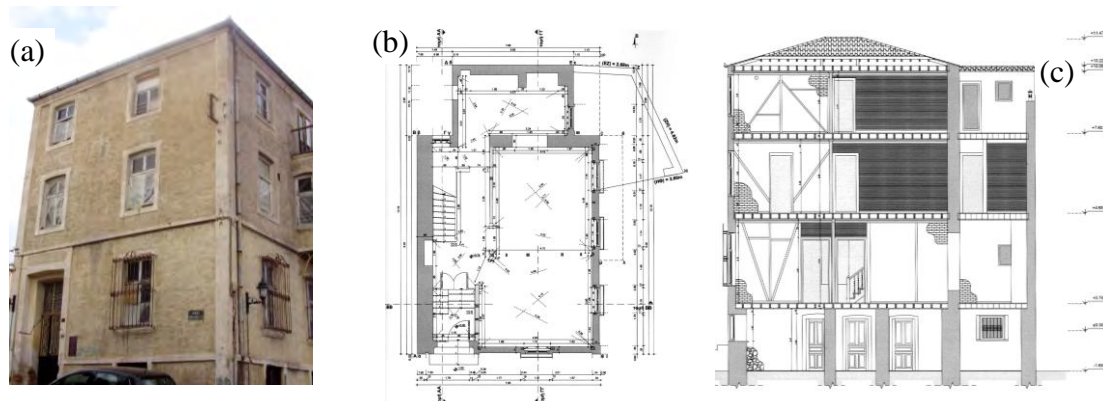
Building C on M. Botsari Street: (a) South-eastern view, (b) Plan (c) Section
